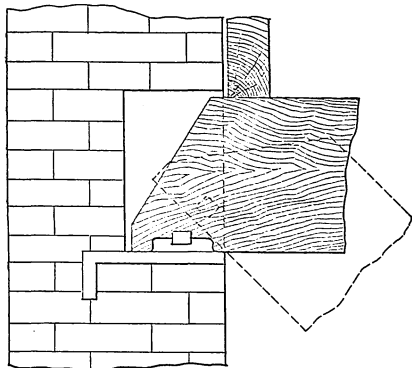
Section of Wall, Showing Joist and Anchor Plate in Position.
